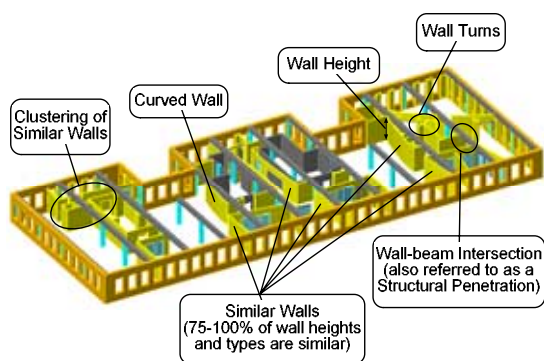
Drywall scope for an office project highlighting some of the design conditions that affect drywall construction.
